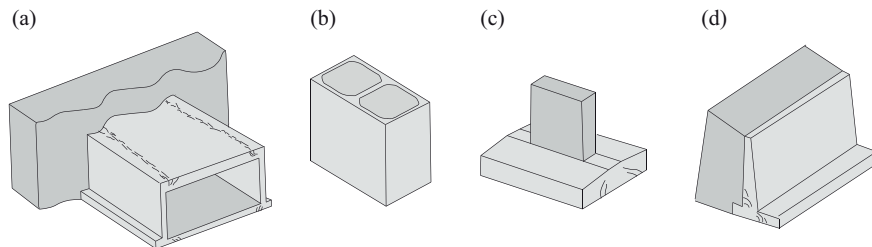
Examples of reinforced concrete one-way slabs and members without stirrups: (a) cut-and-cover tunnel; (b) silo; (c) foundation; (d) retaining wall
